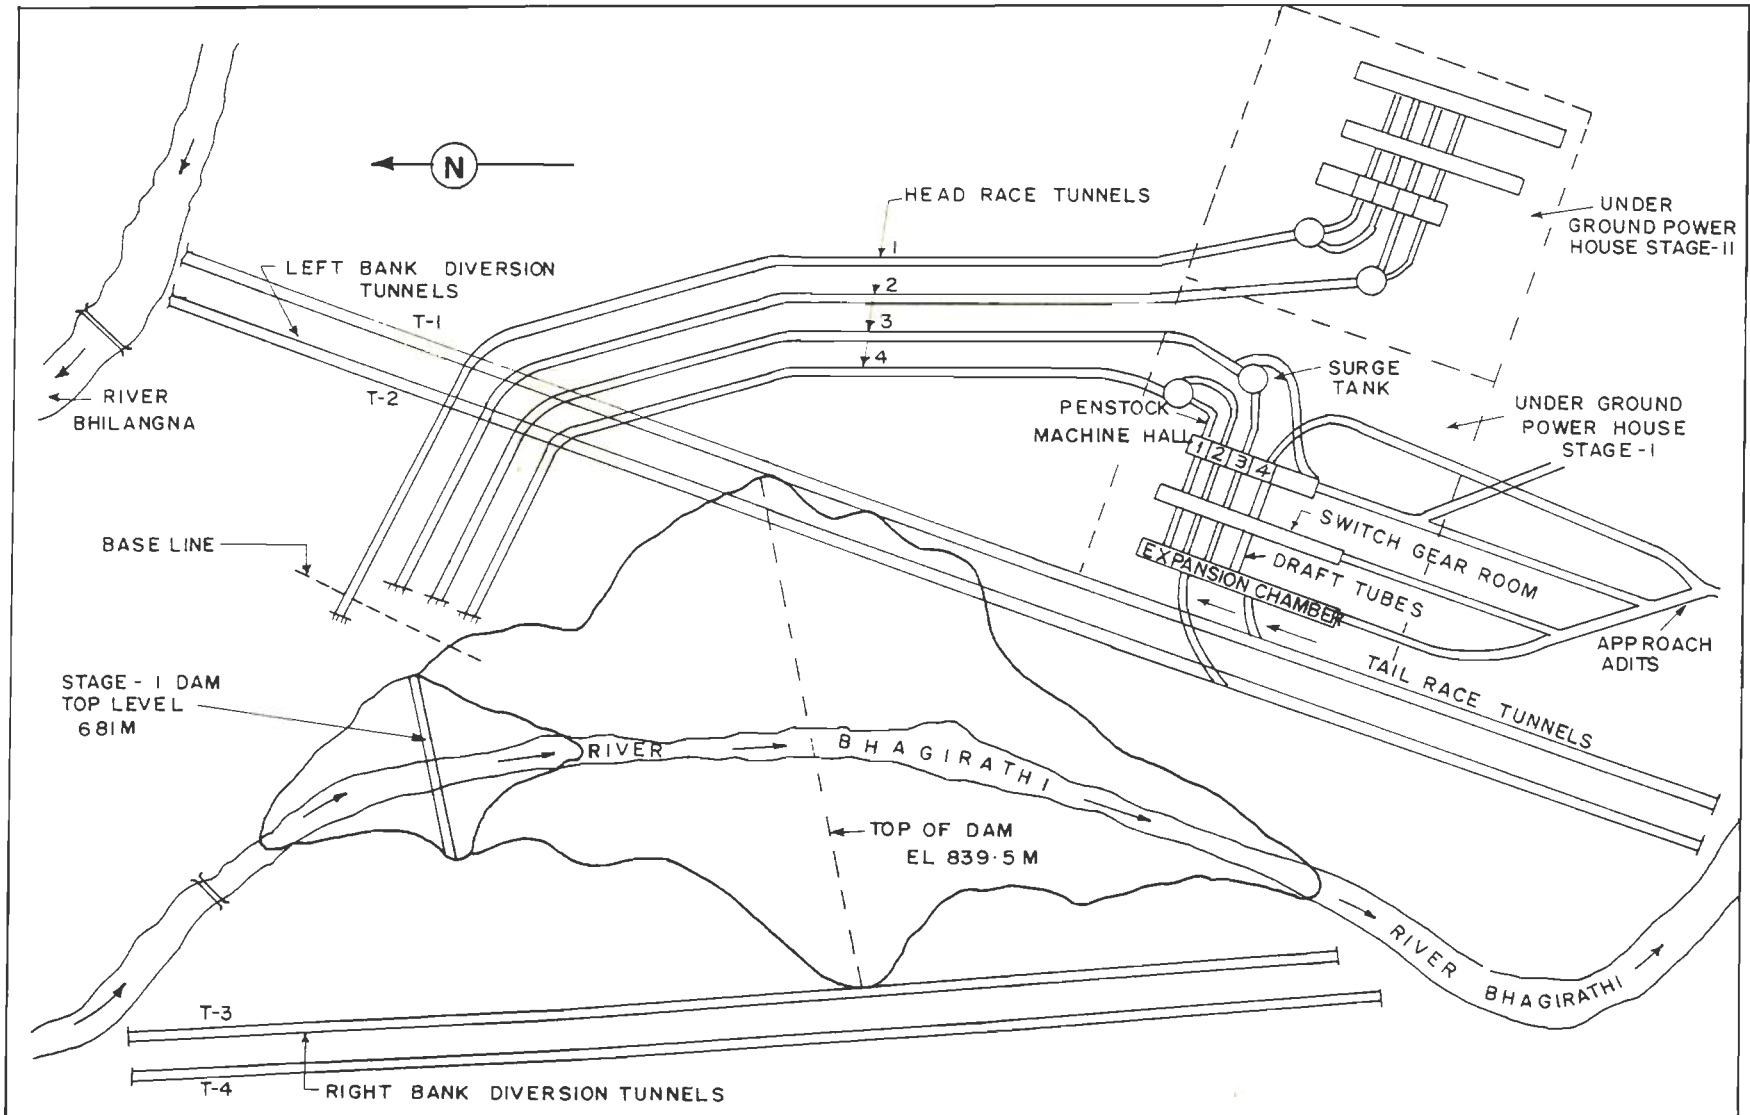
GENERAL LAY-OUT PLAN OF TEHRI DAM PROJECT
